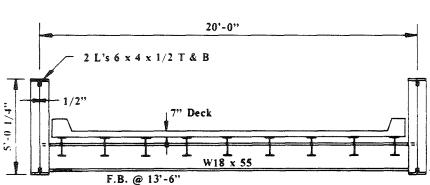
Cross section of 55-ft simple span, through-girder bridge (Ref. 56).
